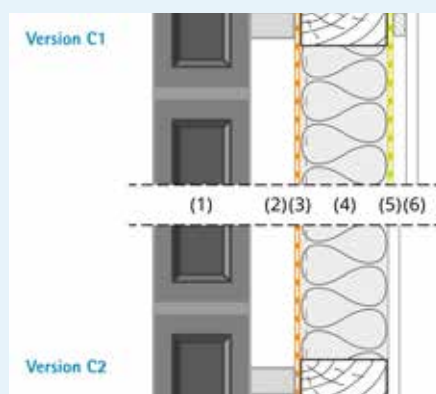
Wall construction C (1) Brickwork, 110 mm; (2) Drainage cavity, 50 mm; (3) Wall wrap, SOLITEX EXTASANA®; (4) Insulation, 90 mm; (5.1) No airtightness layer (C2); (5.2) Airtightness layer INTELLLO® PLUS (C1); (6) Gypsum plasterboard, 10 mm
